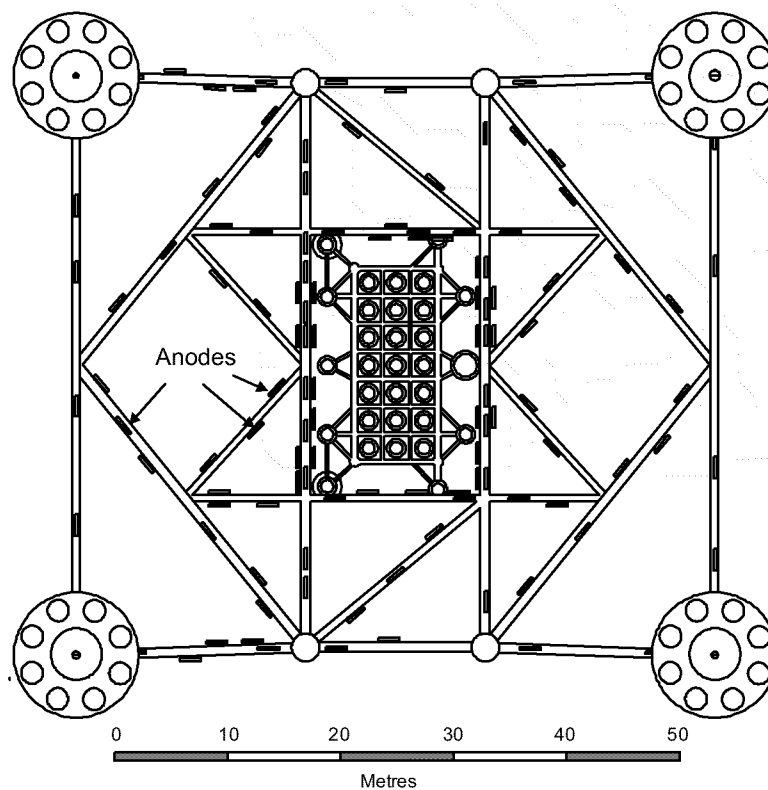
Plan view of a typical fixed steel structure at level of lowest framework
